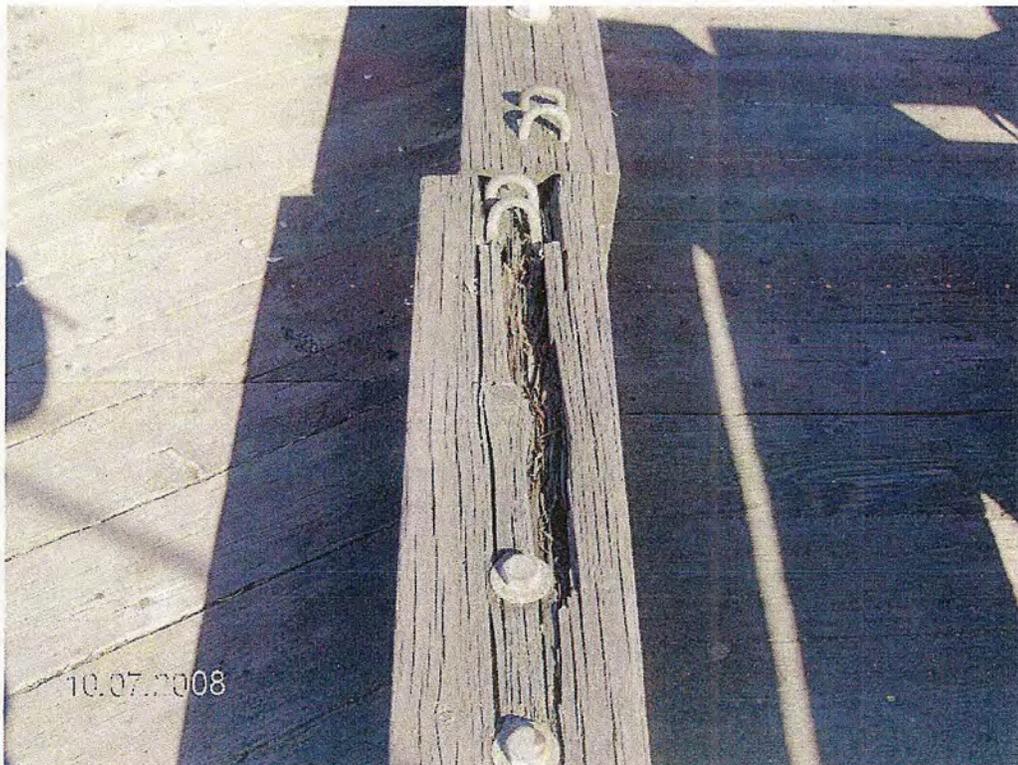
Deterioration of the south curb/traffic rail at the east end of span 8.
